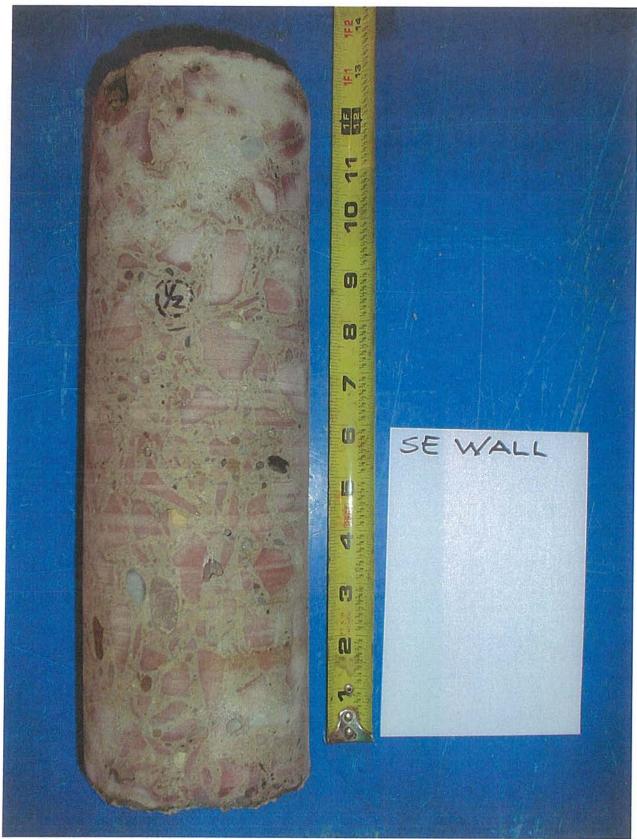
Core sample from the southeast wall showing 1/2 inch steel reinforcement bar
